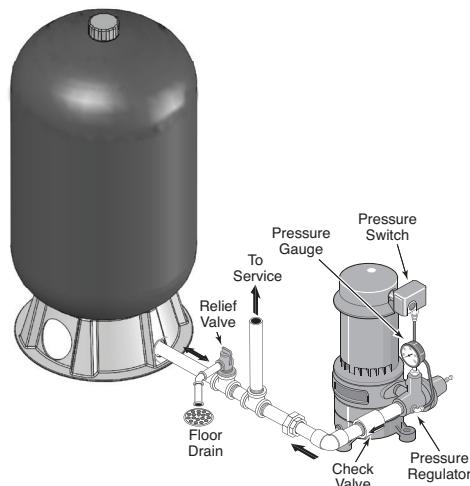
Typical Installation with Vertical Multi-Stage Pump
